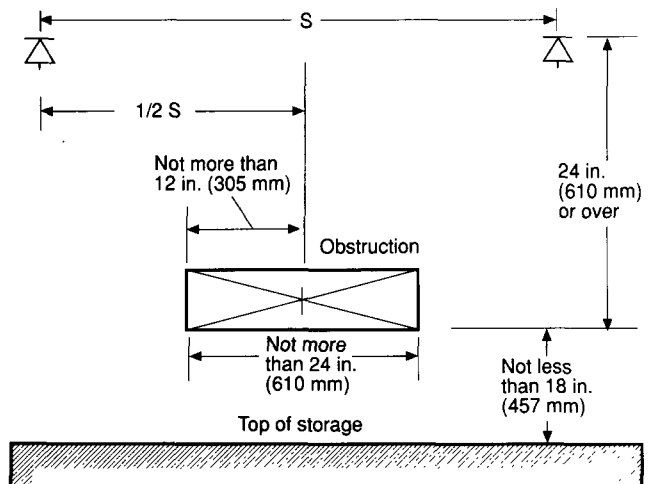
Position of sprinklers in relation to obstructions located 24 in. (610 mm) or more below deflectors.
